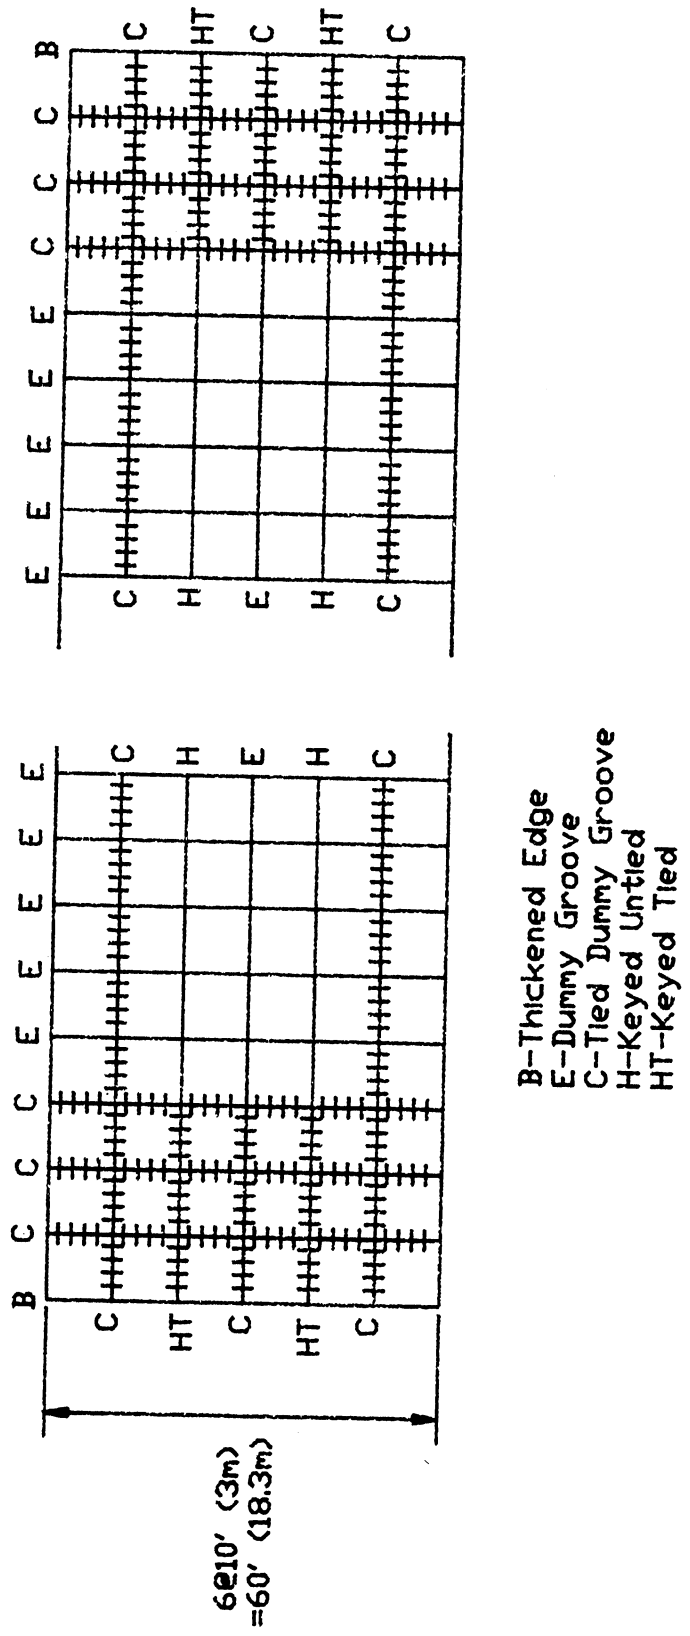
JOINT LAYOUT PATTERNS FOR LIGHT LOAD RIGID PAVEMENTS - 60 FEET WIDE
